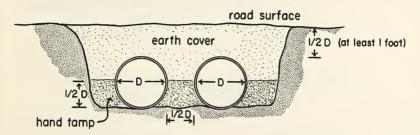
Culvert installation. Earth should be handtamped at least half way up the side of the pipe. Space between pipes in a multiple culvert should be half the pipe diameter. Earth cover over pipes should also be half the culvert diameter in depth but not less than 1 foot.
